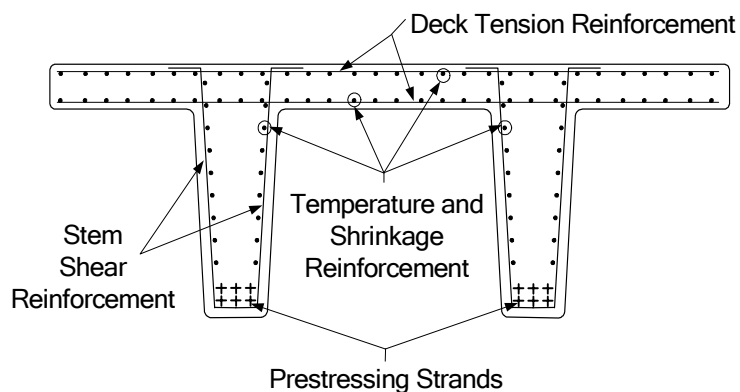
Steel Reinforcement in a Prestressed Double Tee Beam
